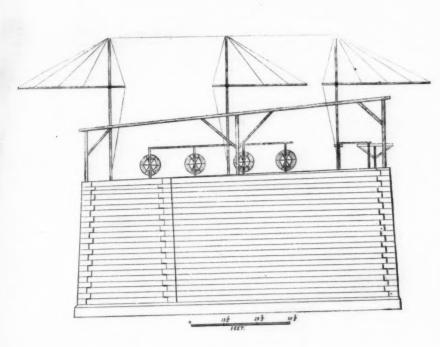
PLAN AND ELEVATION SHOWING CABLE, CRADLE, AND FOOT BRIDGE.
